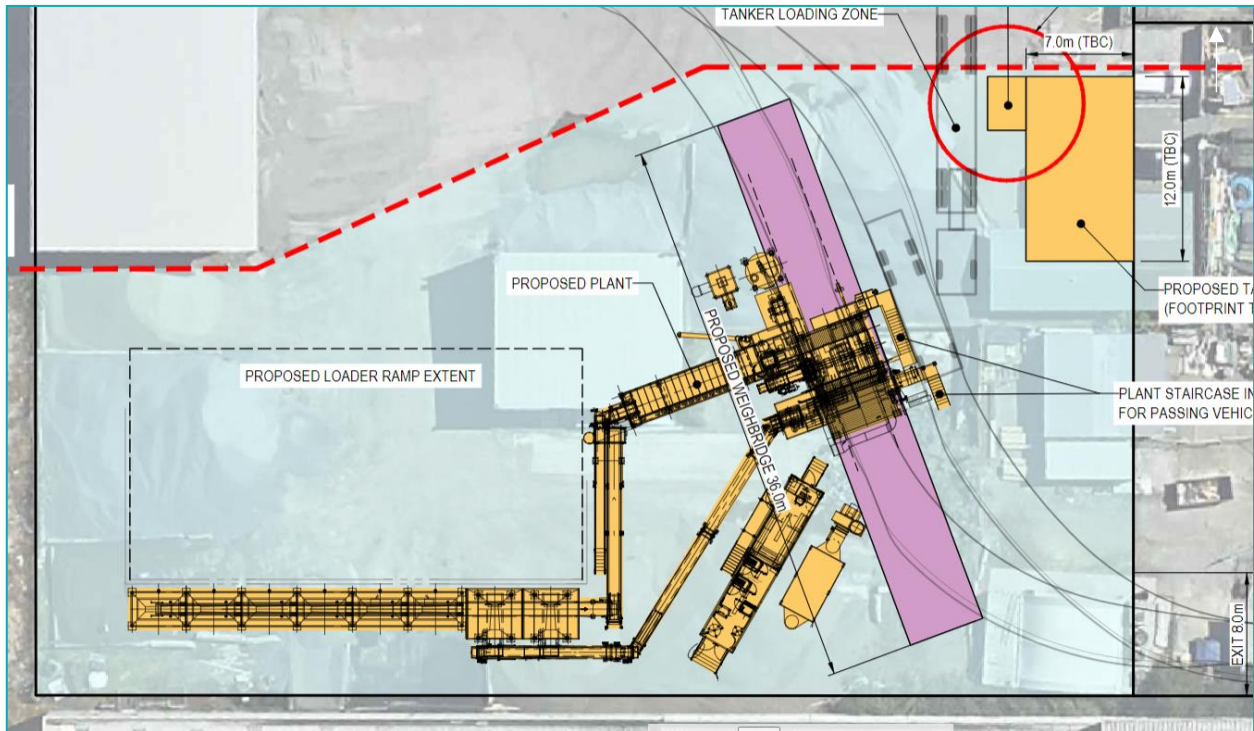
Construction phase works area – indicative only (Preliminary Design – Site Layout Construction Phasing DWG 3936244-SK1)
